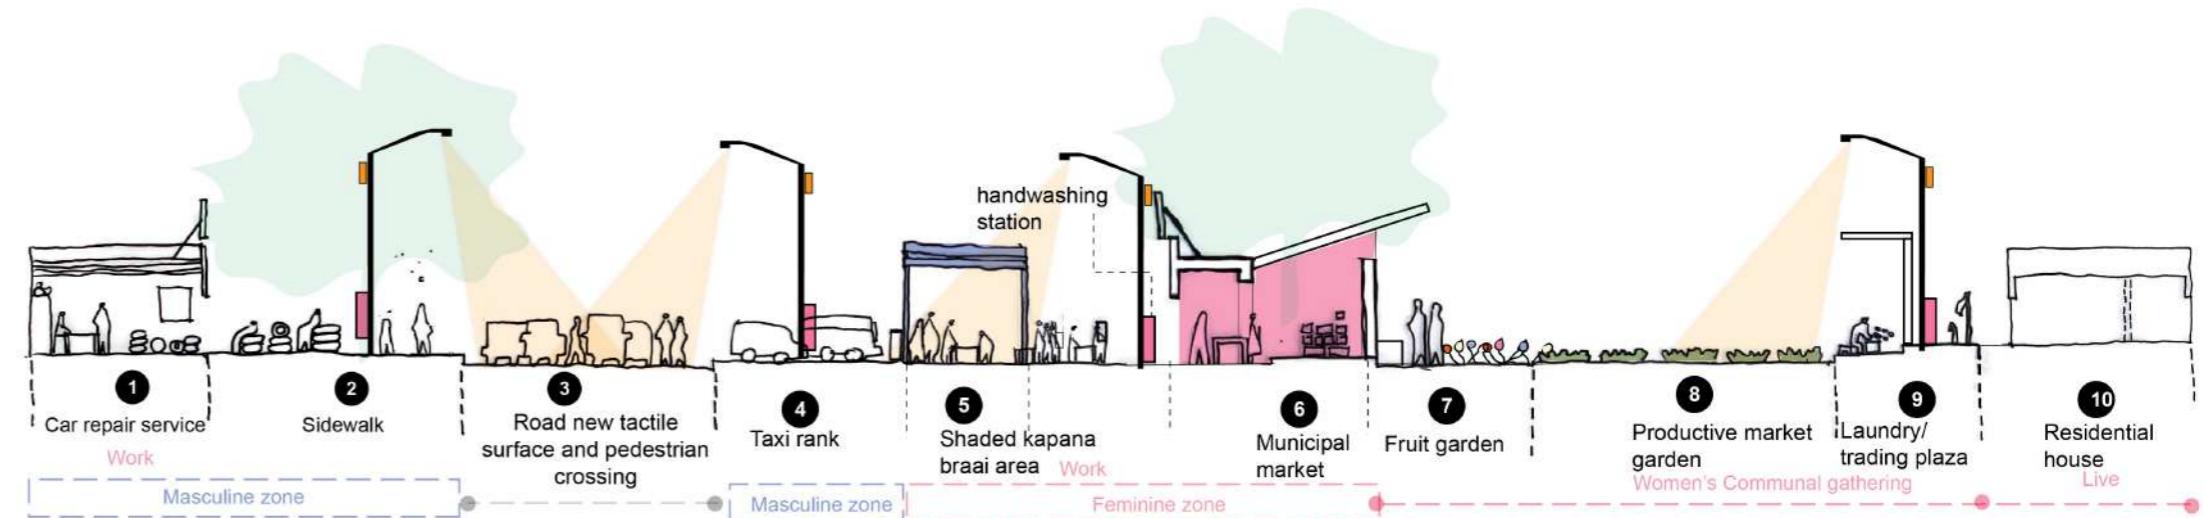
Section of the existing and proposed conditions of the women's food care hub
